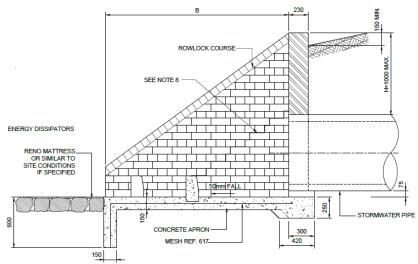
5 Typical Stormwater Headwall with Energy Dissipators
